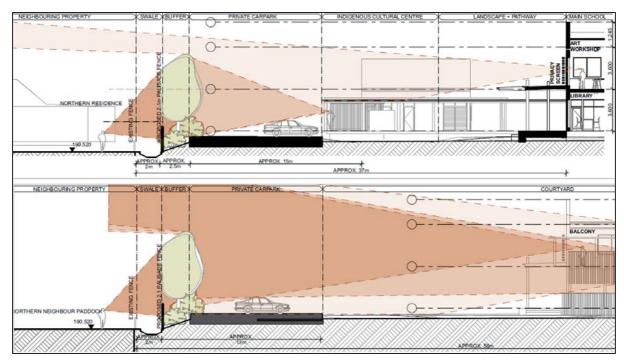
| Relationship between the proposed school windows and the adjoining property at 41 George Street (Source: Applicant's SRtS 2022)
